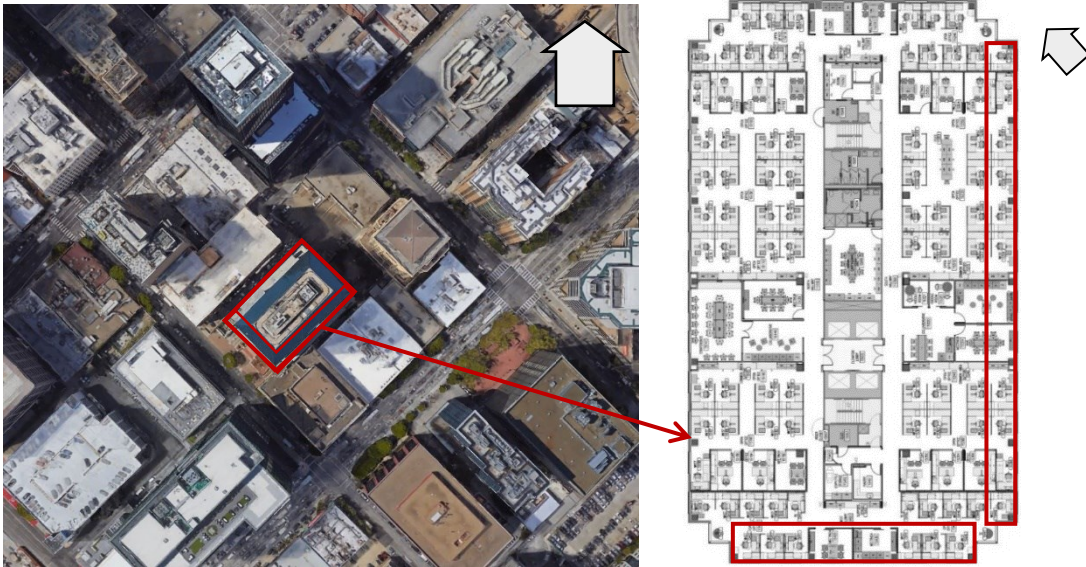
Building location and surroundings (left), and a typical floor plan of the offices (right). Workstations on SE and SW facades are circumscribed.
